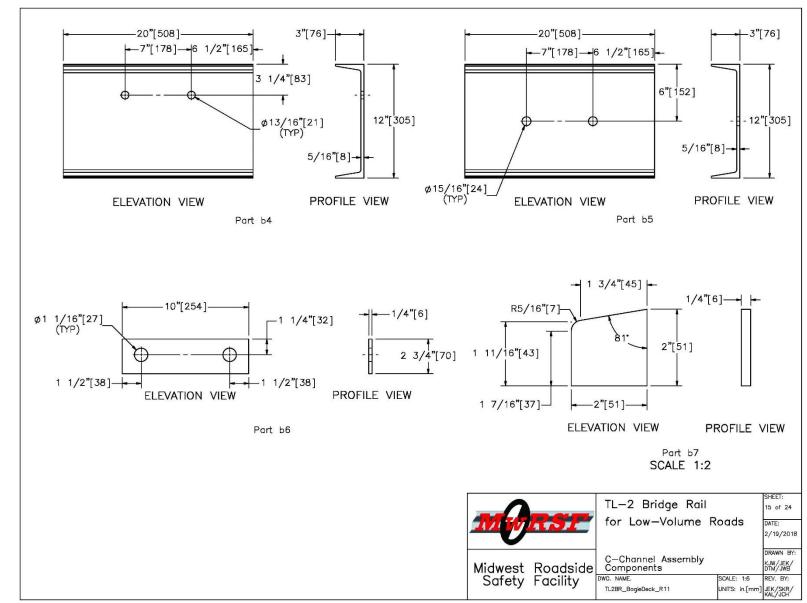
Bogie Testing Matrix and Setup, C-Channel Assembly Components
